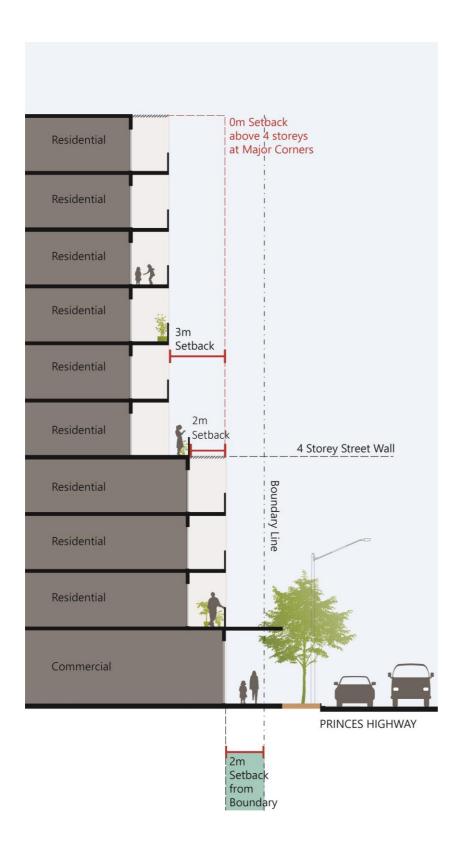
Front setbacks for sites with frontage to the Princes Highway, Harrow Road and Railway Parade North
